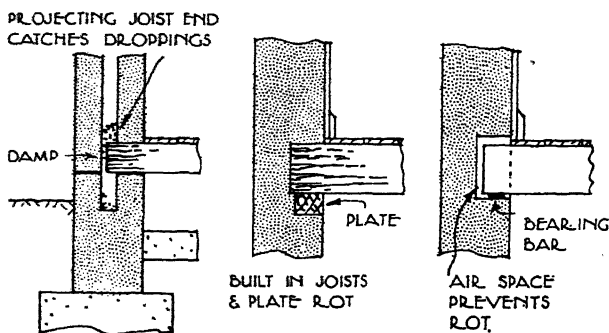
END SUPPORTS FOR WOOD JOISTS
